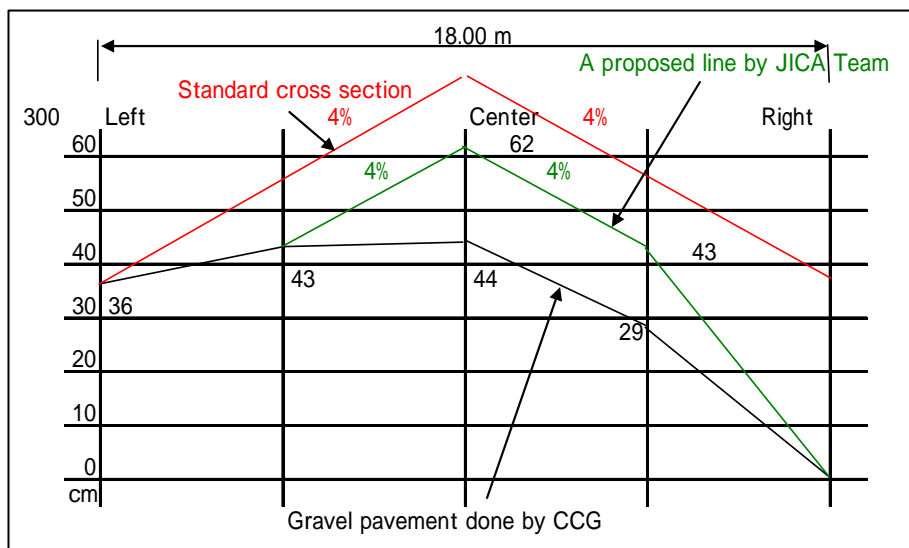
Road Cross-Section During Initial Inspection and Proposed Correction
